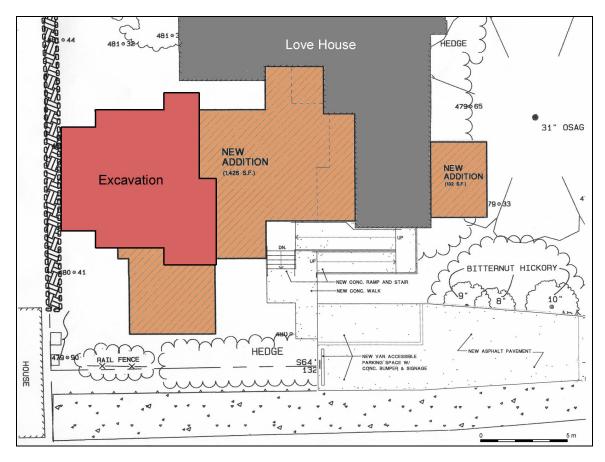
Map of the Love House backyard showing the excavation area relative to the planned addition (as of April, 2004). Architectural plan provided by UNC Facilities Planning.
